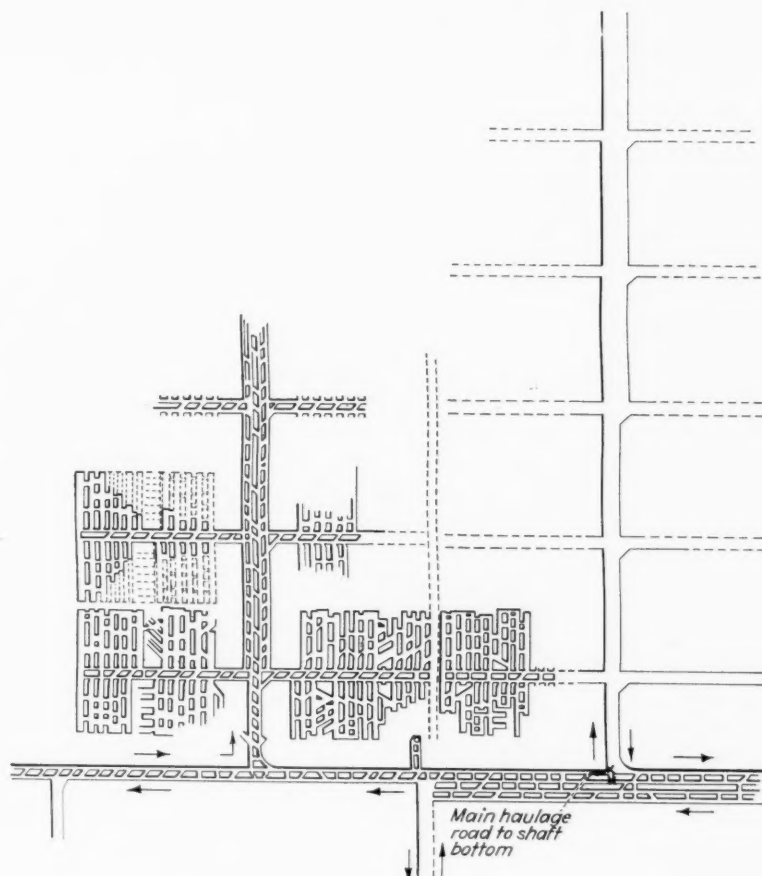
Development plan and typical panel sections at Old Ben No. 8.
